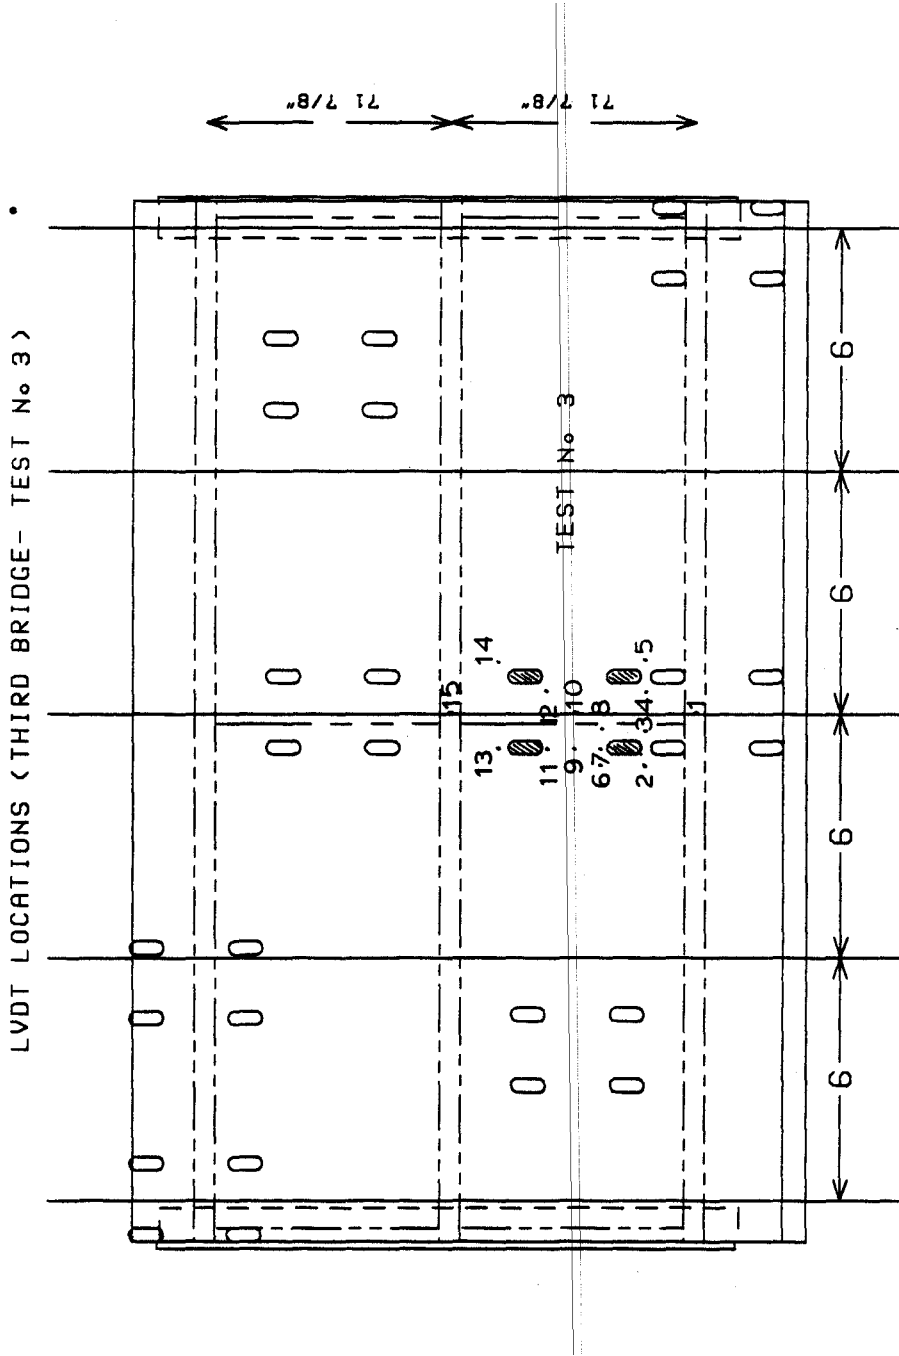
LVDT Locations (Third Bridge - Test No. 3)
